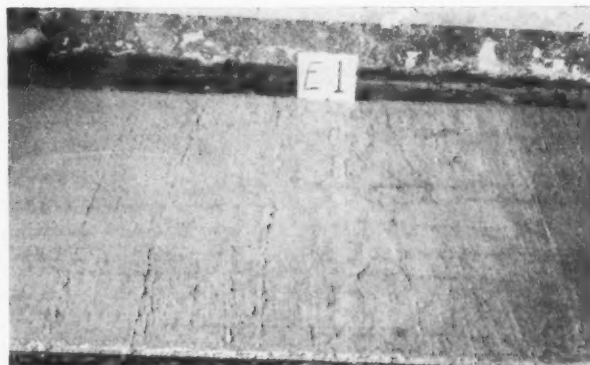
Slab E-1:2:3½, 5 Per Cent Flat Pieces, First Passage of Screed.
